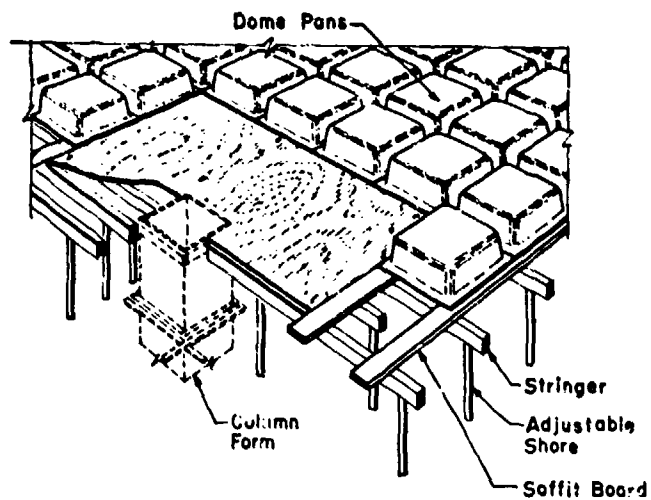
Example of two-way pan slab formwork (Courtesy of American Concrete Institute)
